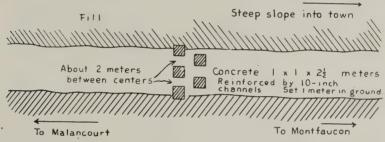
Concrete Barrier Across Road at Entrance to Montfaucon.
